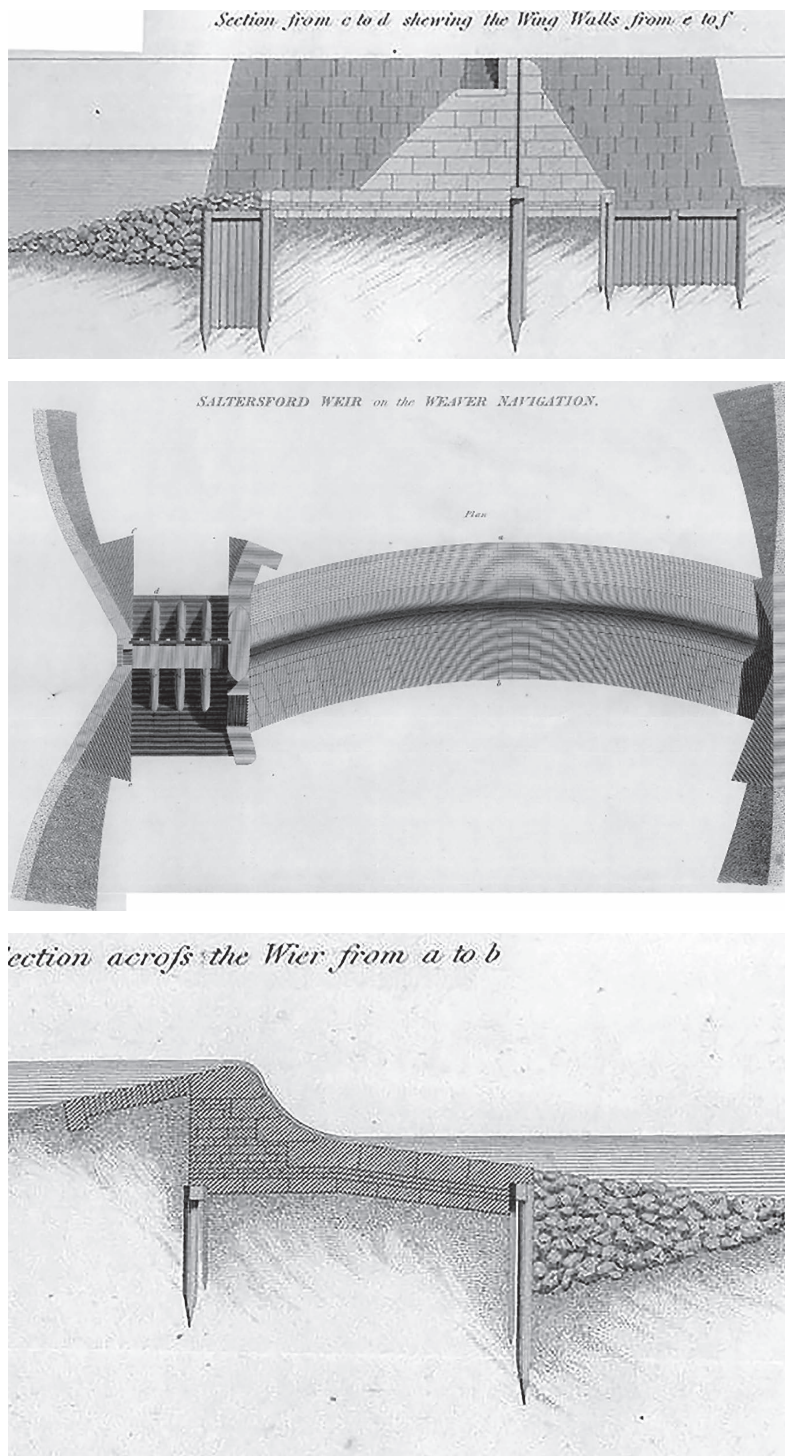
Detail of Saltesford weir on the Weaver Navigation showing timber piling supporting masonry structure (from Thomas Telford, 1838)
